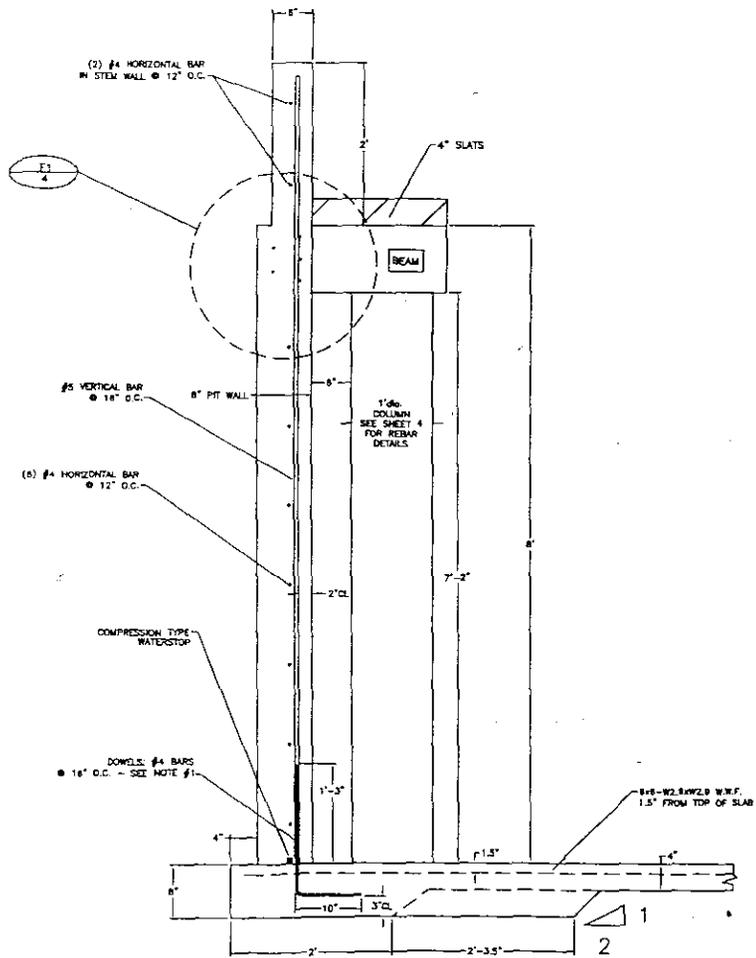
CONCRETE ENDWALL BEAM SIDE VIEW
